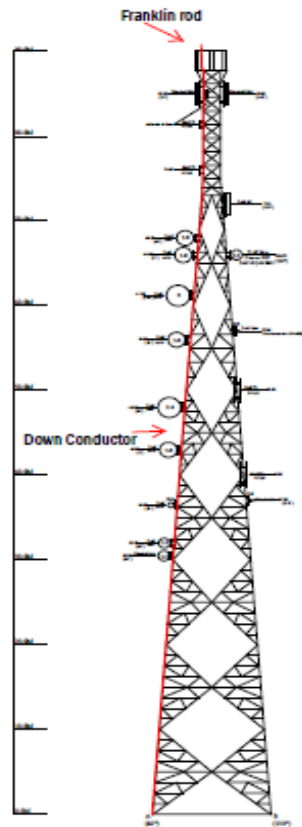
Air terminal and down conductor arrangement of a tower structure
